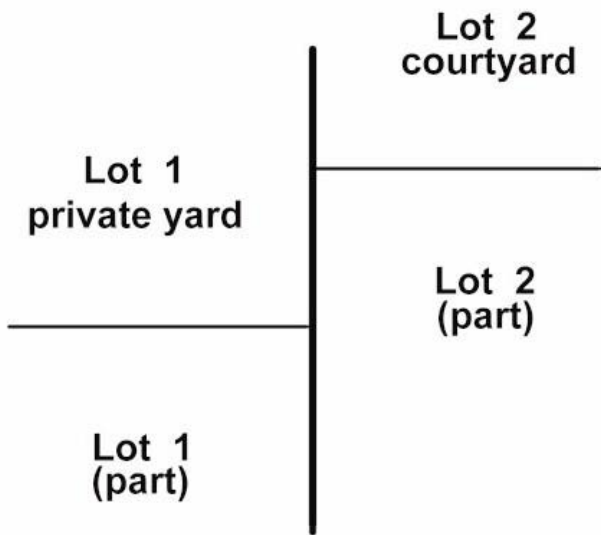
Private Yard – acceptable – does not adjoin main part of adjoining lot.
